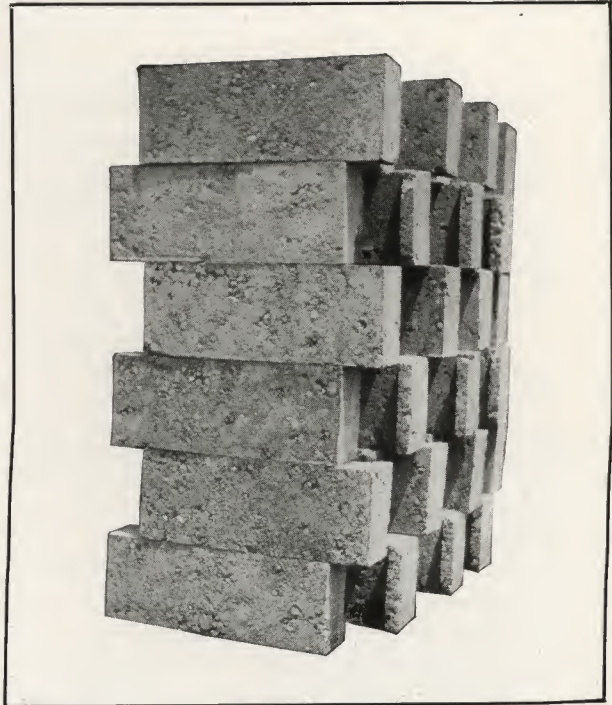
Concrete block with rough texture surfaces provide a backing to which portland cement stucco clings tenaciously. The stucco cannot crack or separate from the wall.
